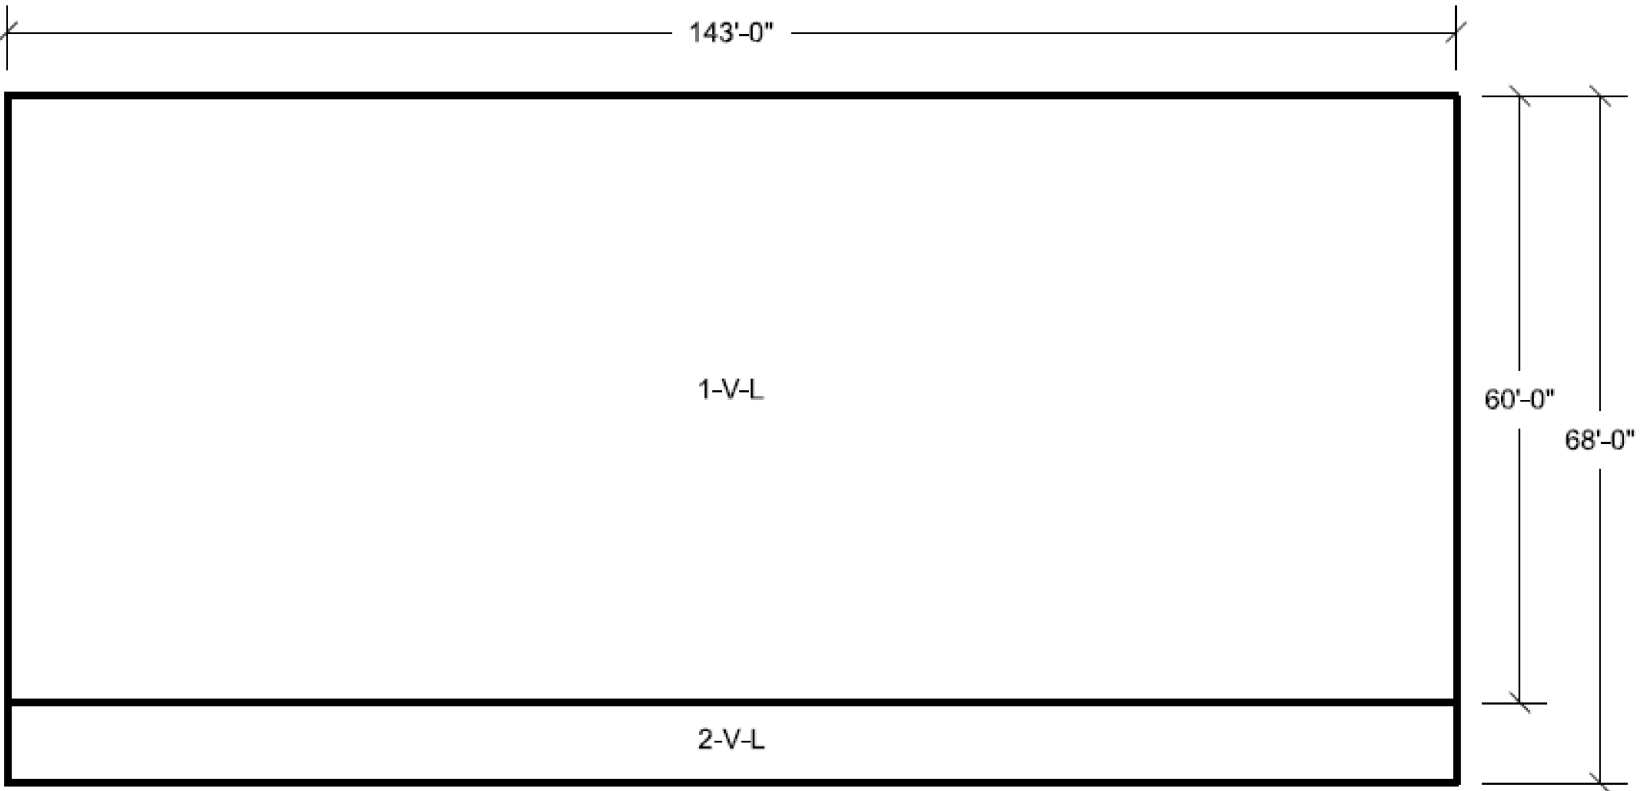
H.6-52 Pump House North Wall Looking South Vertical Reinforcement Zones Near Side Face
